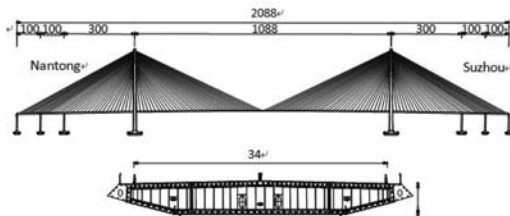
General Layout of the Sutong Bridge and typical section (Dimensions in meter).
